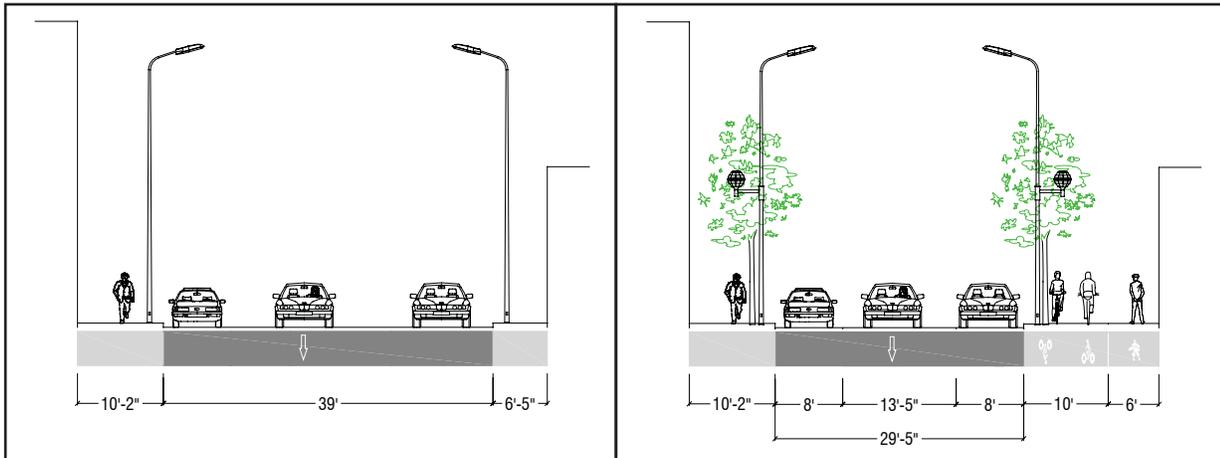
Park Avenue between East 138<sup>th</sup> Street and East 135<sup>th</sup> Street, existing and recommended cross section (facing south)
